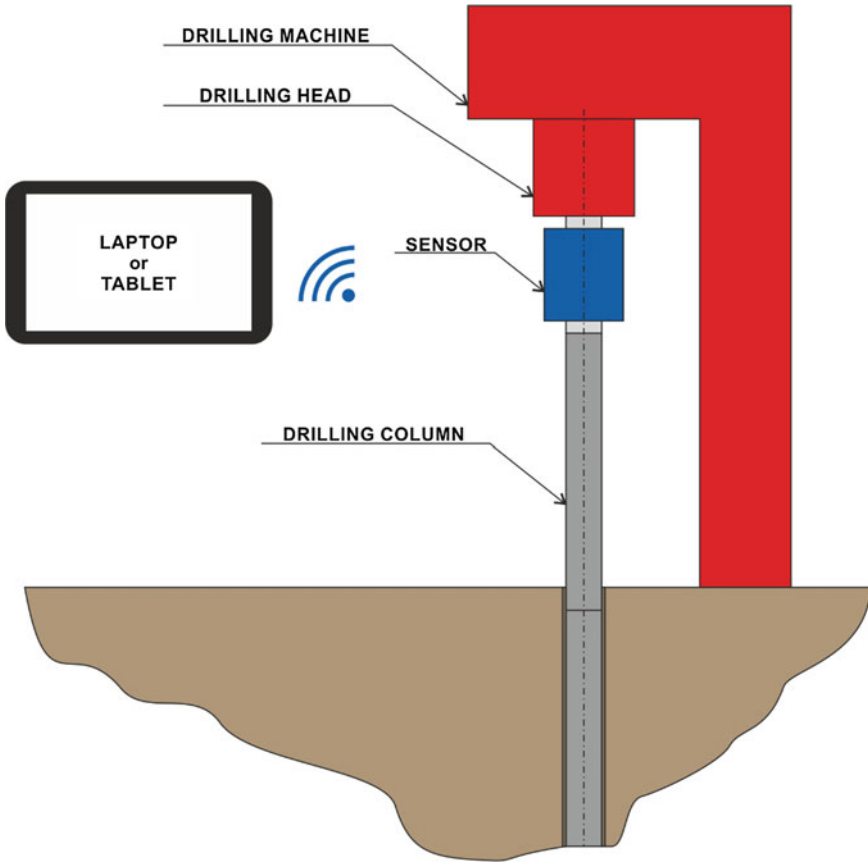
Concept sketch of the designed sensor usage including the drilling machine
